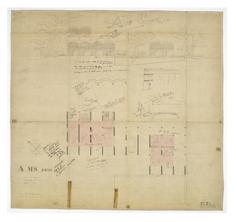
Main Floor Plan and Southwest Elevation (7 March 1952)¹⁰
